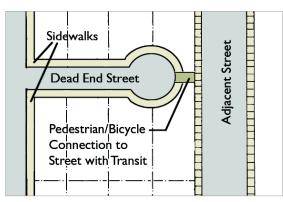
d: Diagram of a pedestrian-pass through connection between a dead end street and an adjacent street.
